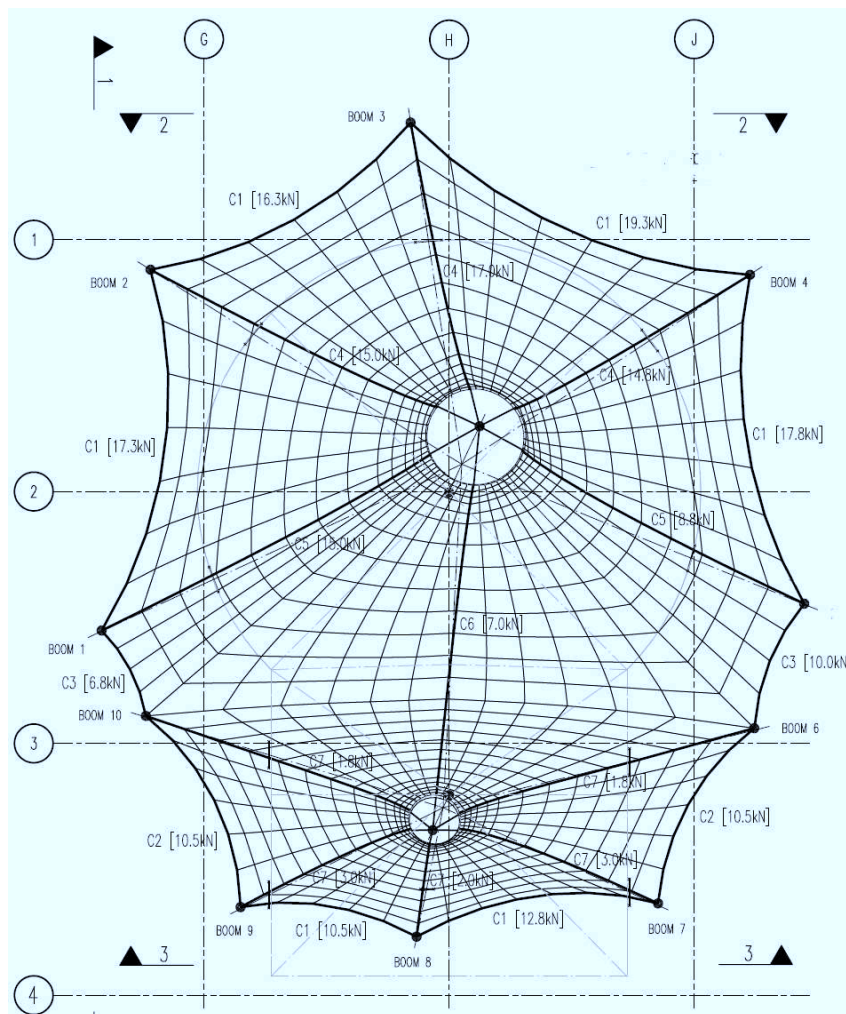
Plan showing pretensions in cables of Creche Canopy (Arup)
